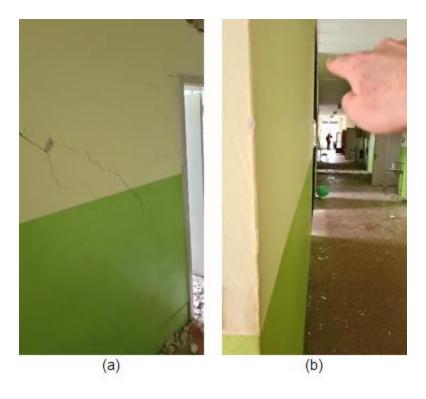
(a) Diagonal cracks due to in-plane loading and (b) out-of-plane infill failure due to in-plane/out-of-plane interaction (source: Nenad Bijelić and Damir Lazarević).
